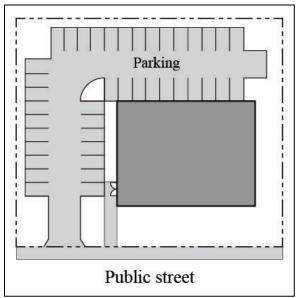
Parking to the Side or Rear of Buildings.
